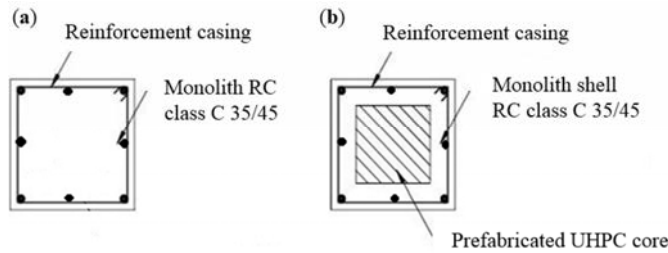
(a) Simple section (no UHPC core); (b) Compound section (with UHPC core)
